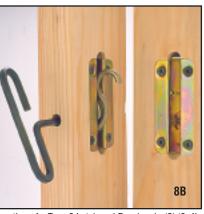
A & 8B This flange-to-flange mounting of a Type 3 Latch and Receiver in (2) '2x4's is typical of the heavier framing applications. (See TDS 107)
